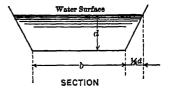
(Part 2 of 3) —Hydraulic Elements of Trapezoidal Sections.
